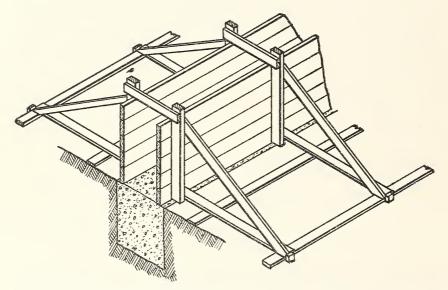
The substantial form bracing required for concrete foundation or wall construction above ground
